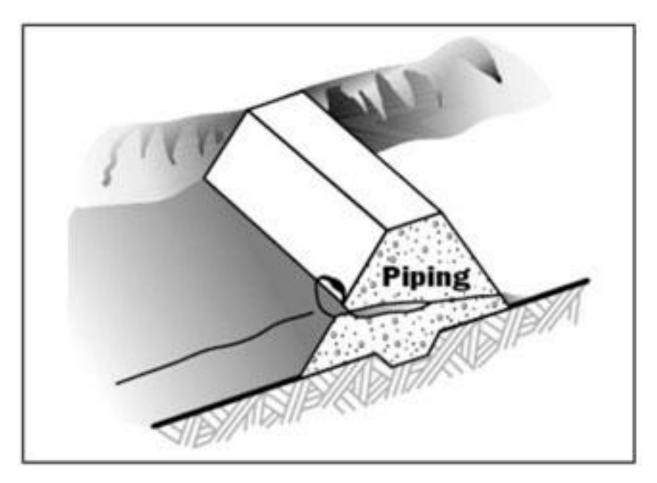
Diagram of a pipe forming in an embankment dam *Source: Dam Safety: An Owner's Guidance Manual
